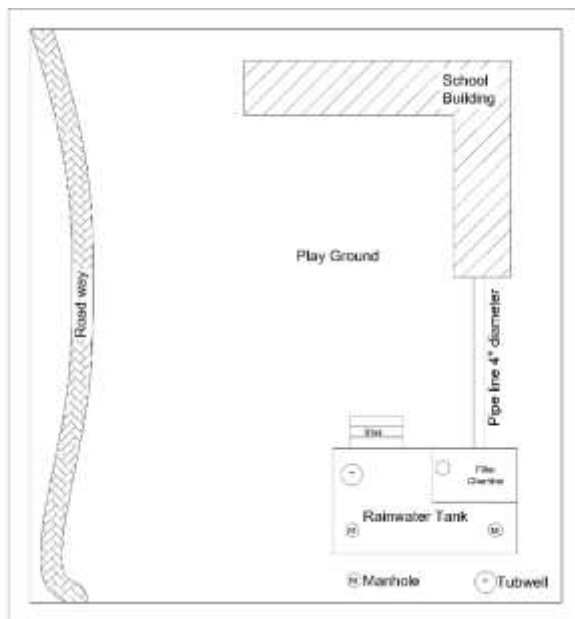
Example layout for an Institution-scale rainwater harvesting system
